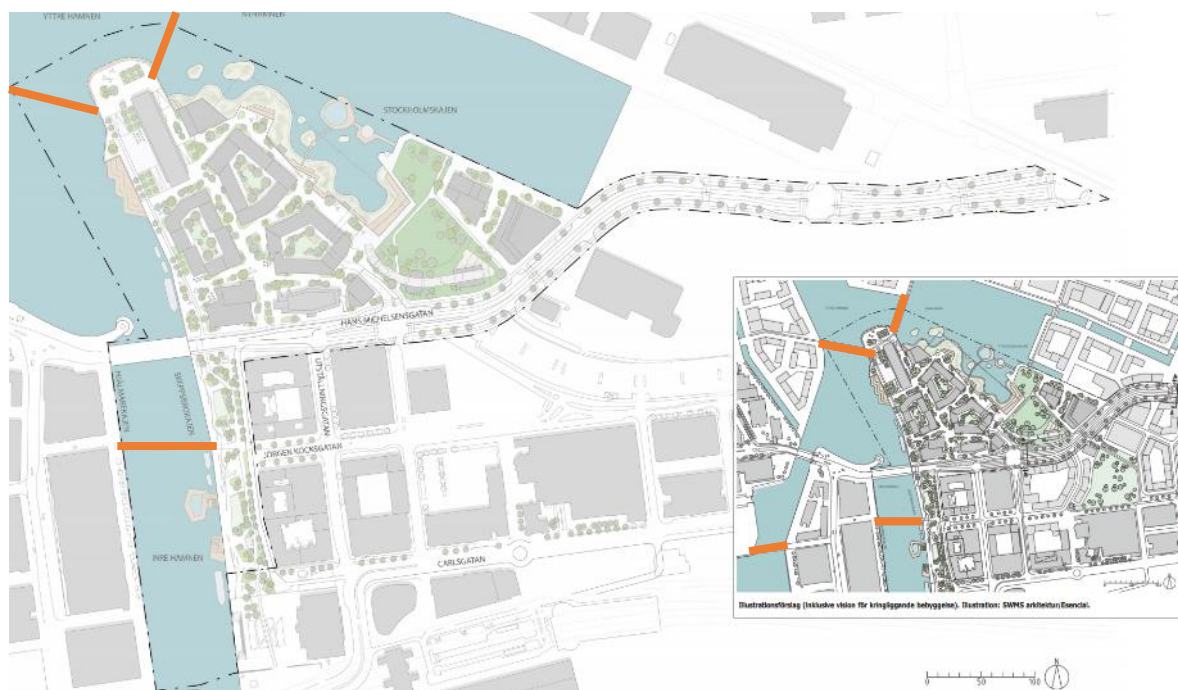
Overview of Smörkajen. New bridge connections are marked in orange. (Detailed development plan Smörkajen, City of Malmö)
